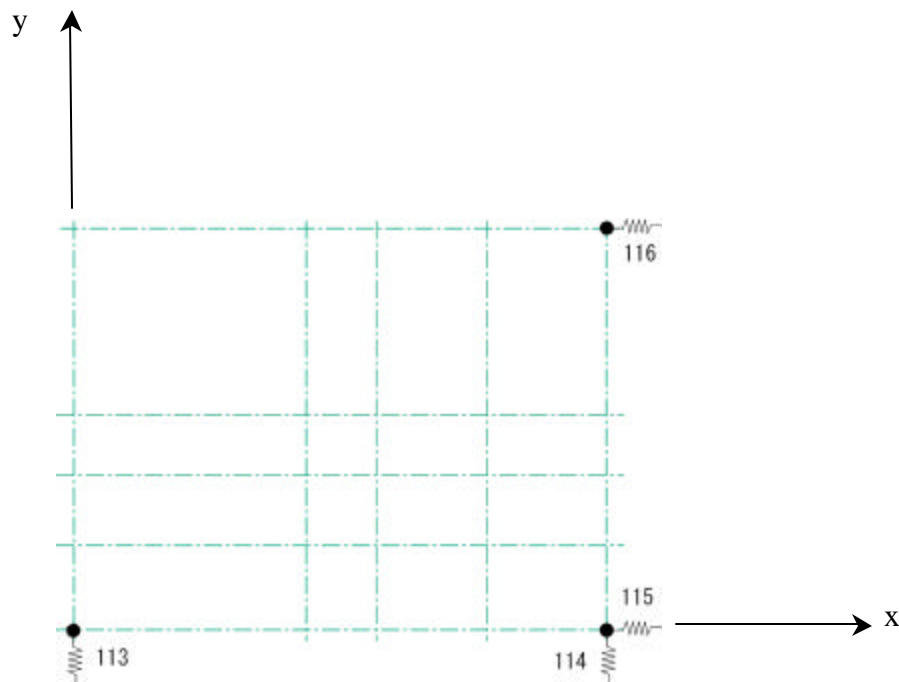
Location, Orientation and Numbering of Shear Elements for Foundation Walls (stem or cripple) of the Small-House Index Building.
